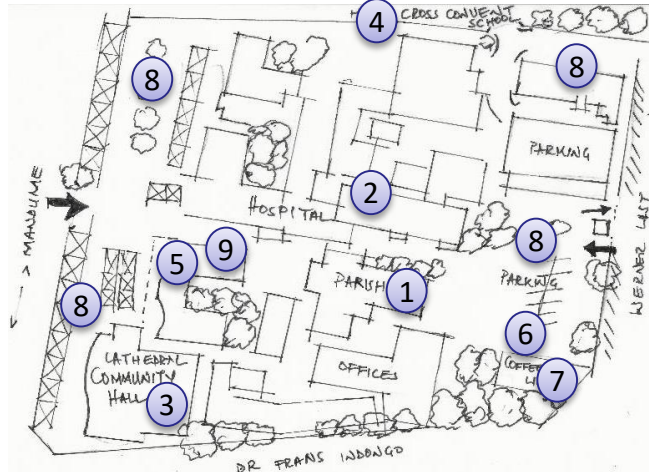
Roman Catholic Church CBD sketch site layout (Author 2021).
